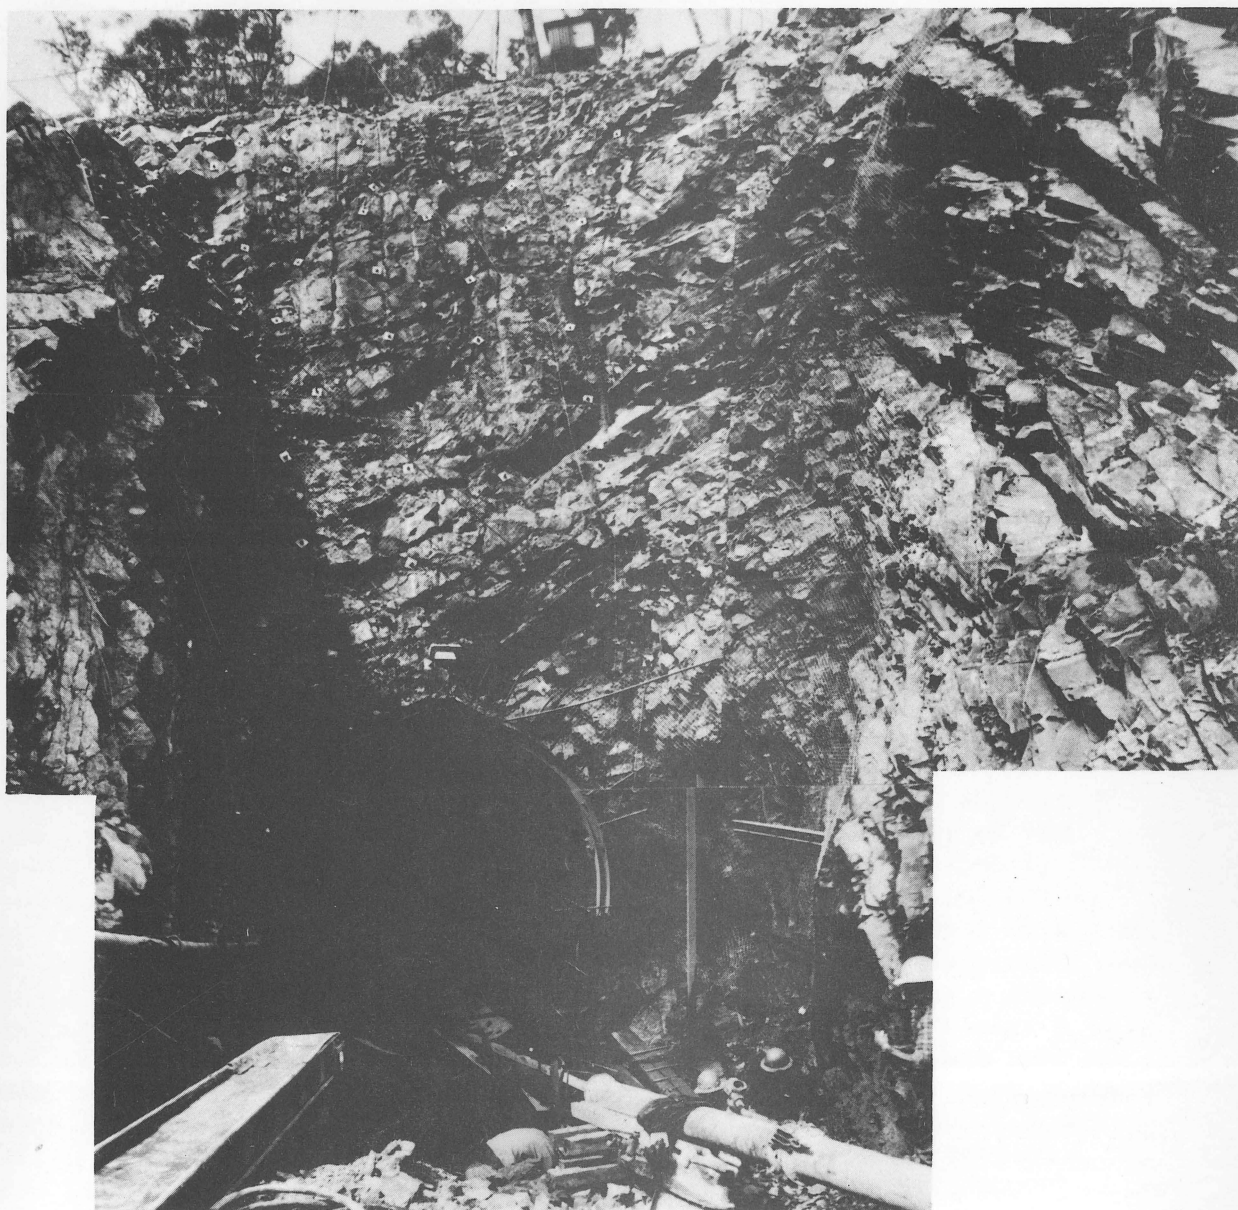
Composite photograph of the inlet portal excavation showing the rock bolts and wire mesh supporting the portal face.
